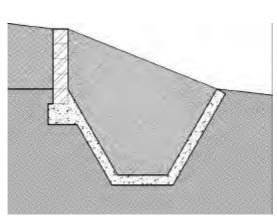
The present configuration of fill against the wall, obscuring the moat and wall. Not to scale.
